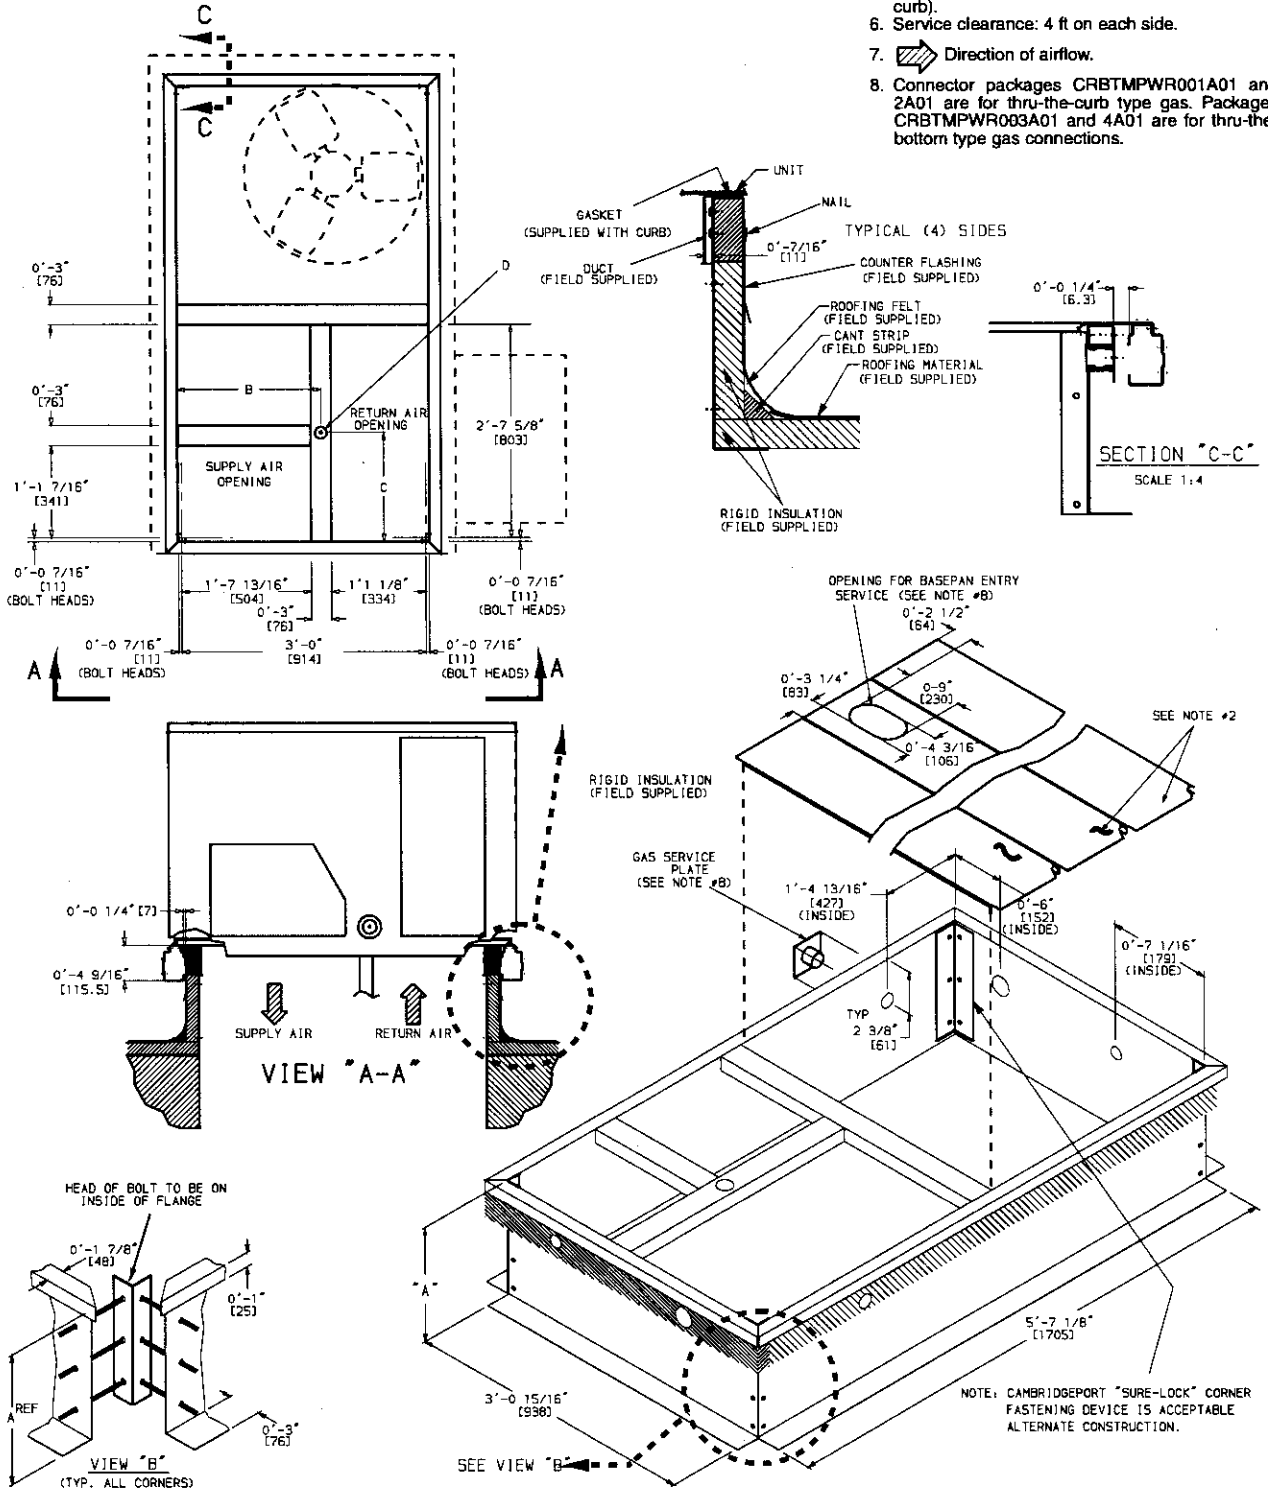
A — Roof Curb Details (48/50HJ004-007 Section Only)
